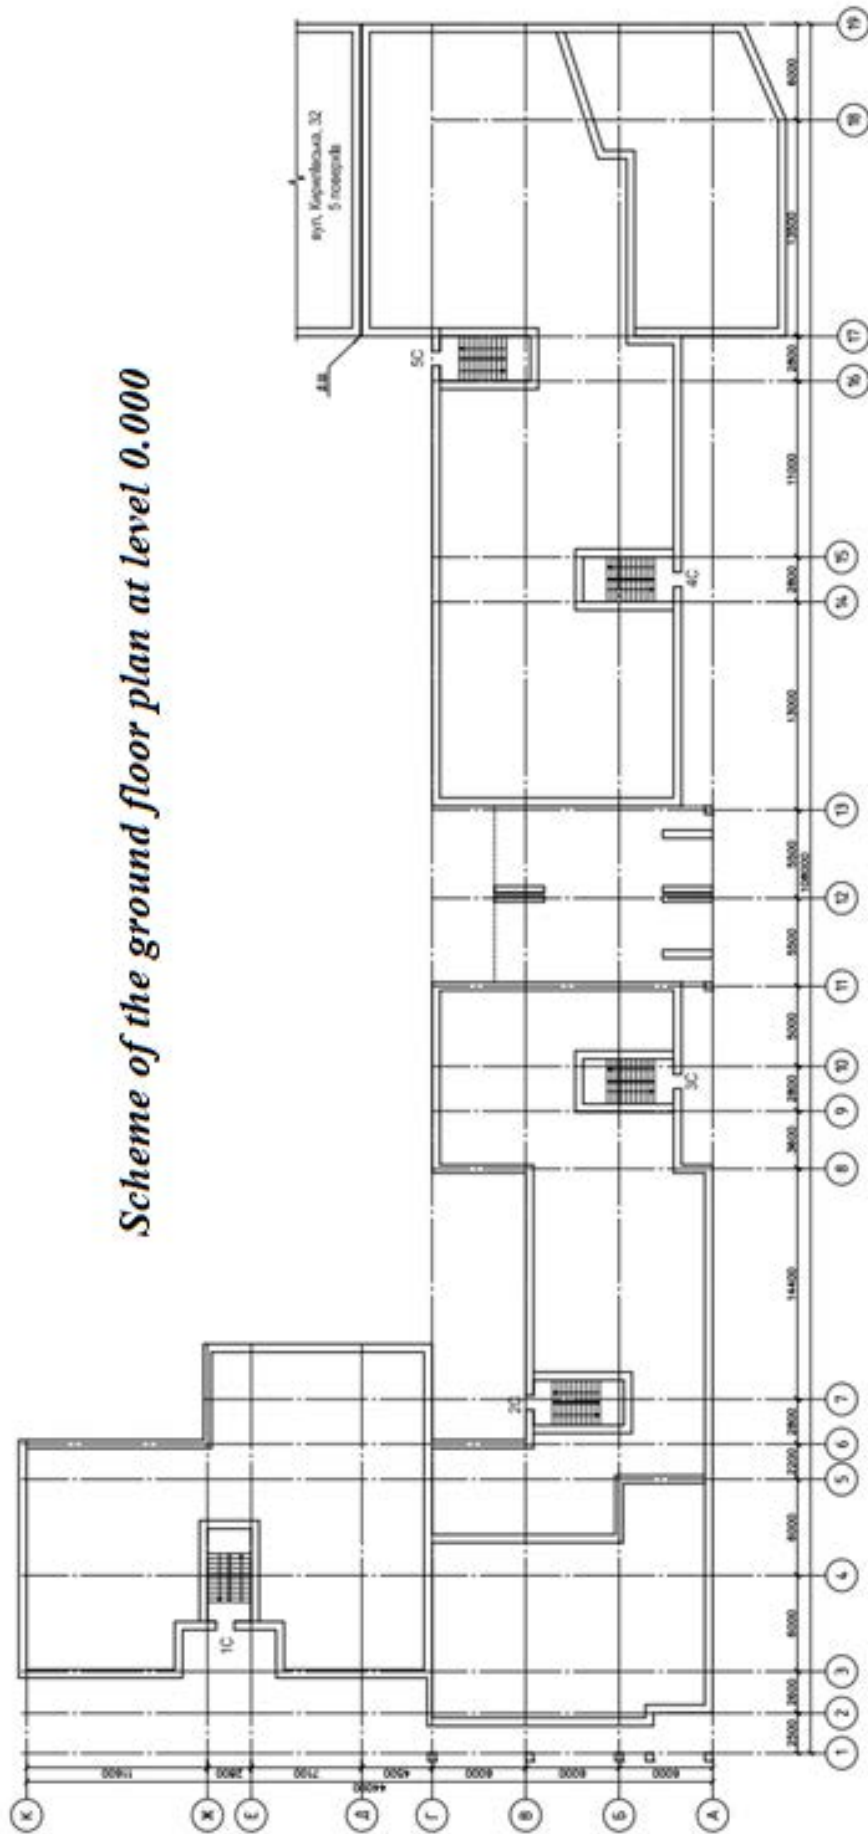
Floor Plan Scheme of a Sectional Residential Building at 0.000 Level
